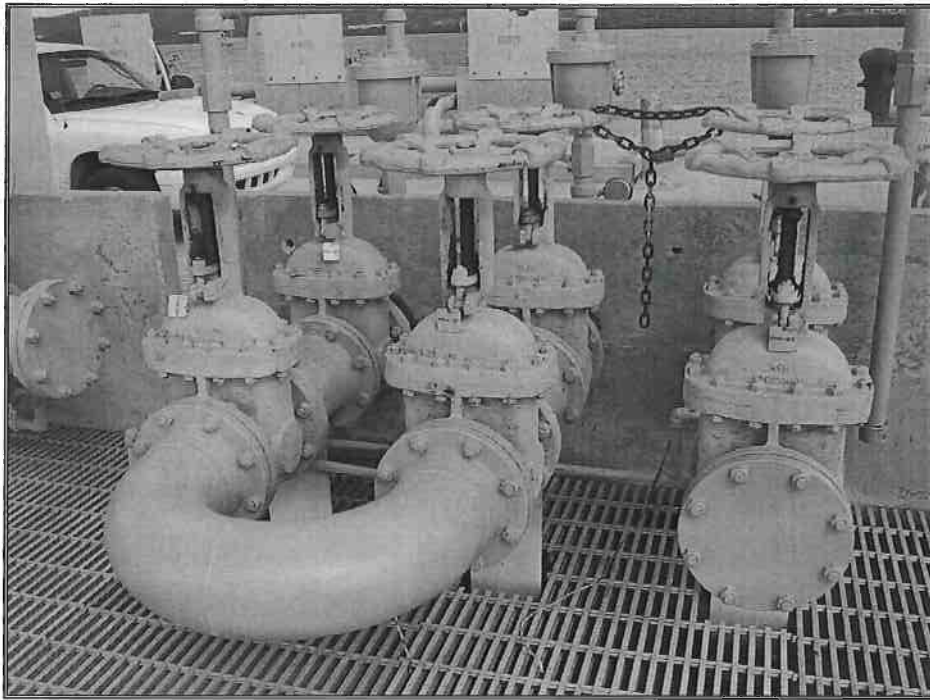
A – Pier 1A Crossover Connection JP-5, DFM and DFM-S
